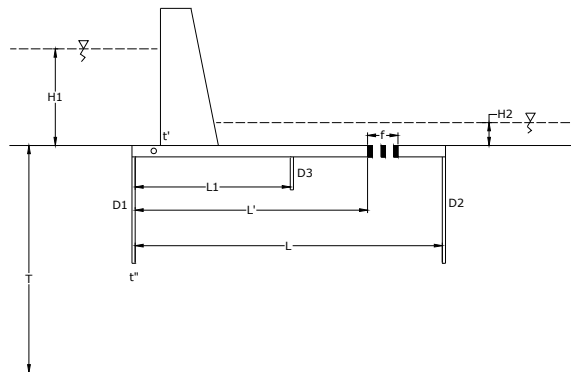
Variables in mathematical model of the foundation of concrete gravity dam.
